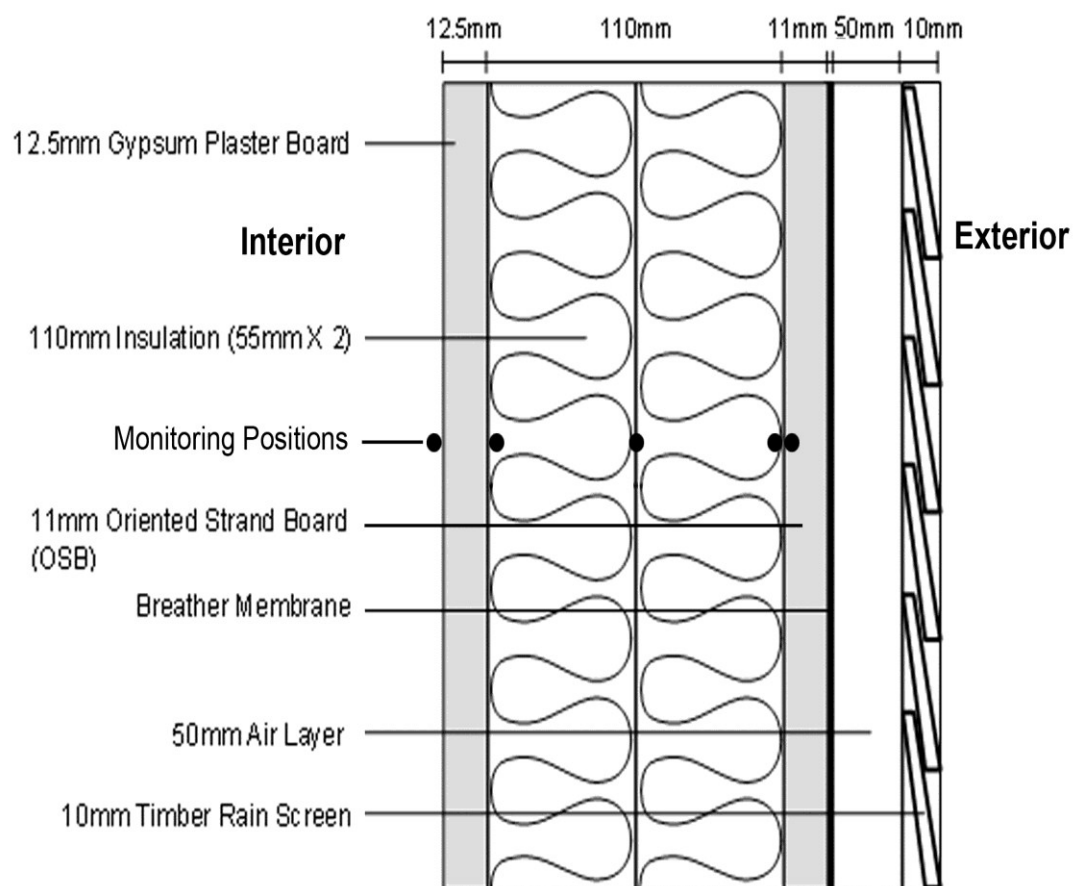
The vertical cross section of the timber frame wall assembly without vapour barrier (wall-1).
